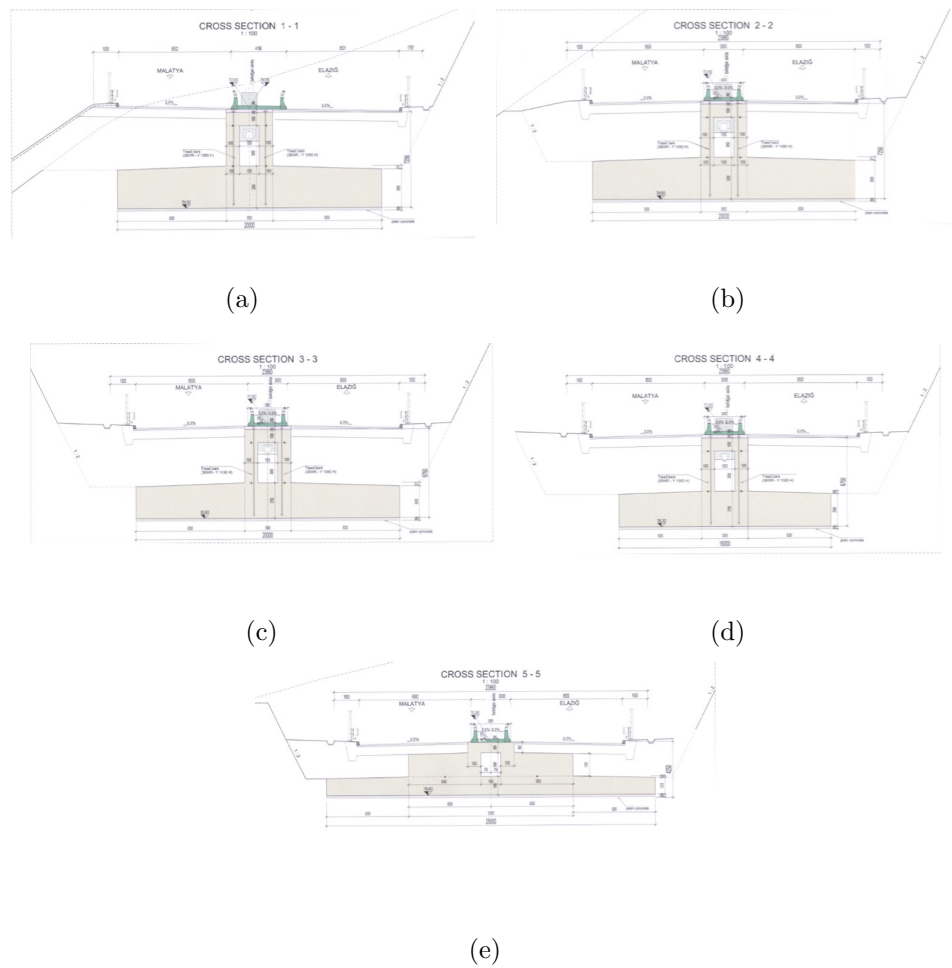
(a) Cross-section details of the back span anchorage block in cross-section 1-1, (b) cross-section 2-2, (c) cross-section 3-3, (d) cross-section 4-4, (e) cross-section 5-5.
